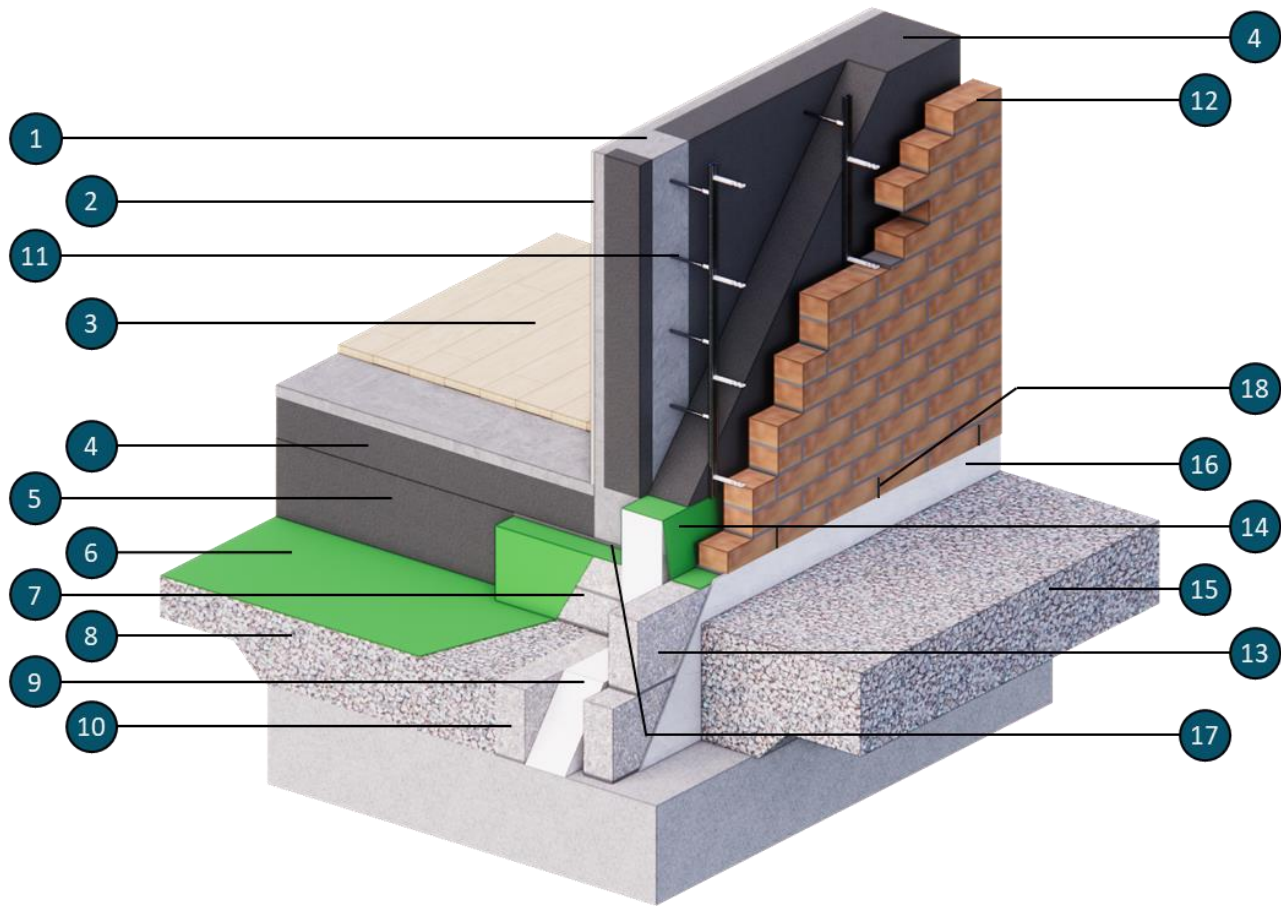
External wall with traditional brick/block outer leaf cladding to substructure detail
